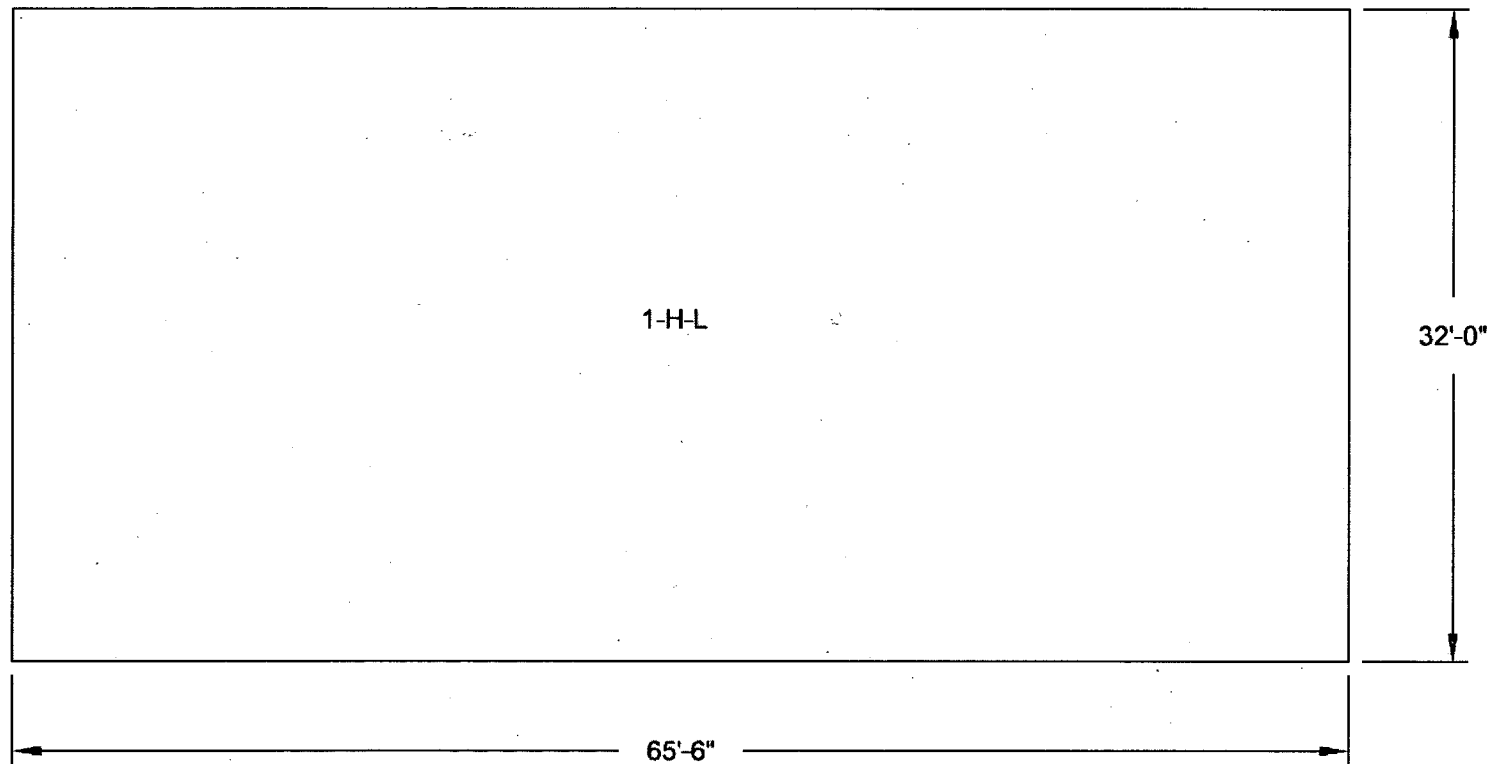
H.6-163 Wall 7 Looking From Outside
